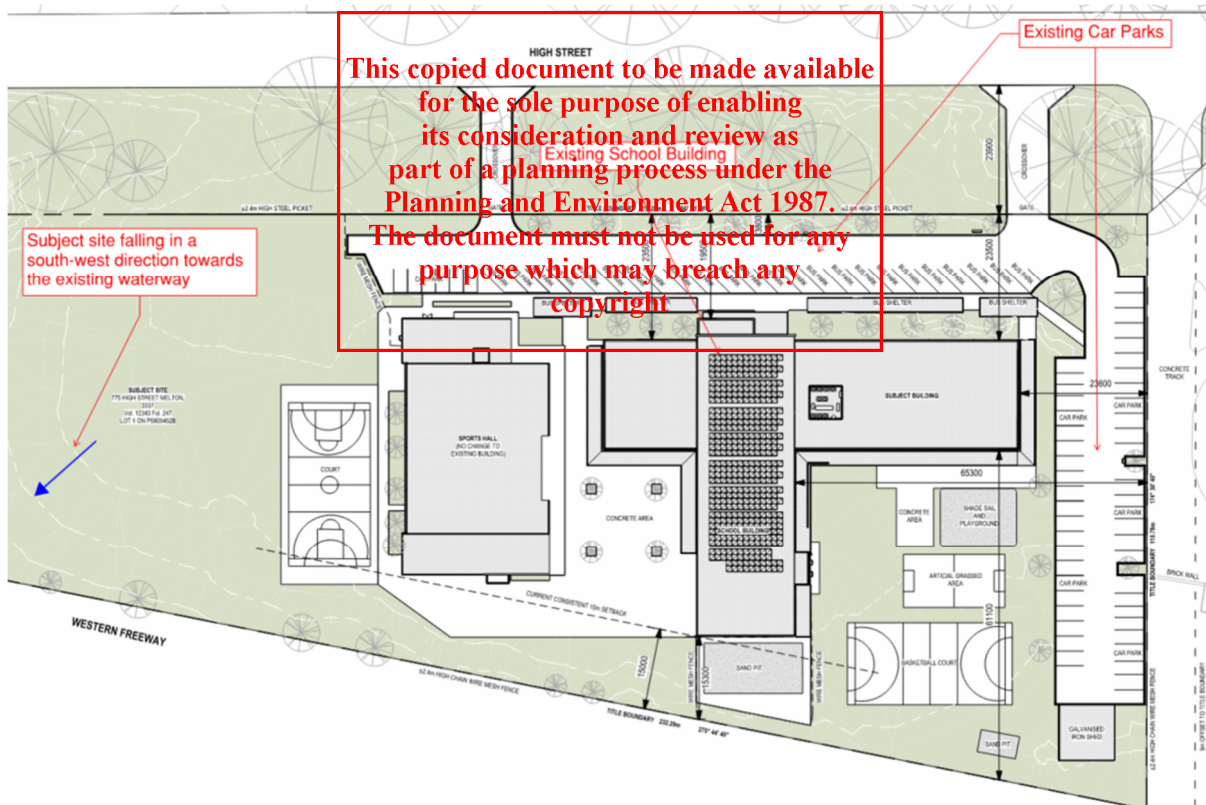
Subject Site Existing Conditions – East Portion (Image courtesy of DETAIL X Studio).
